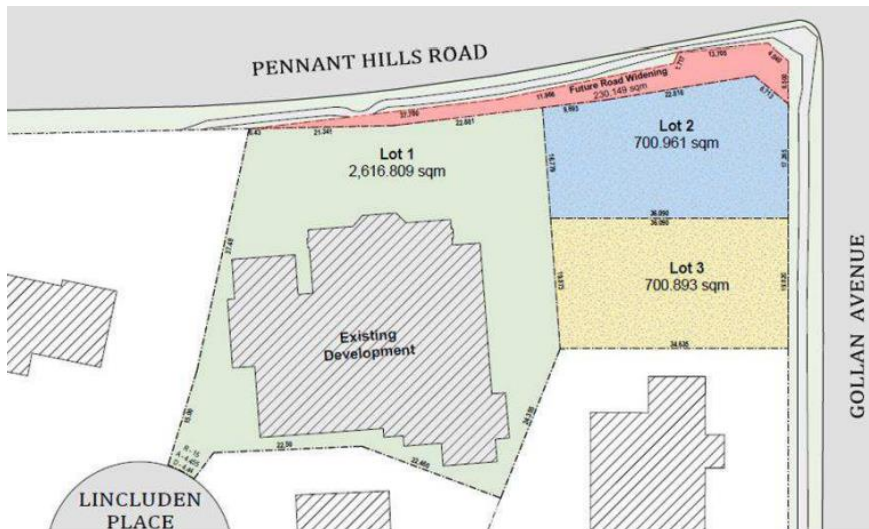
Proposed Subdivision Plan for the site (source: Council LPP Report)
